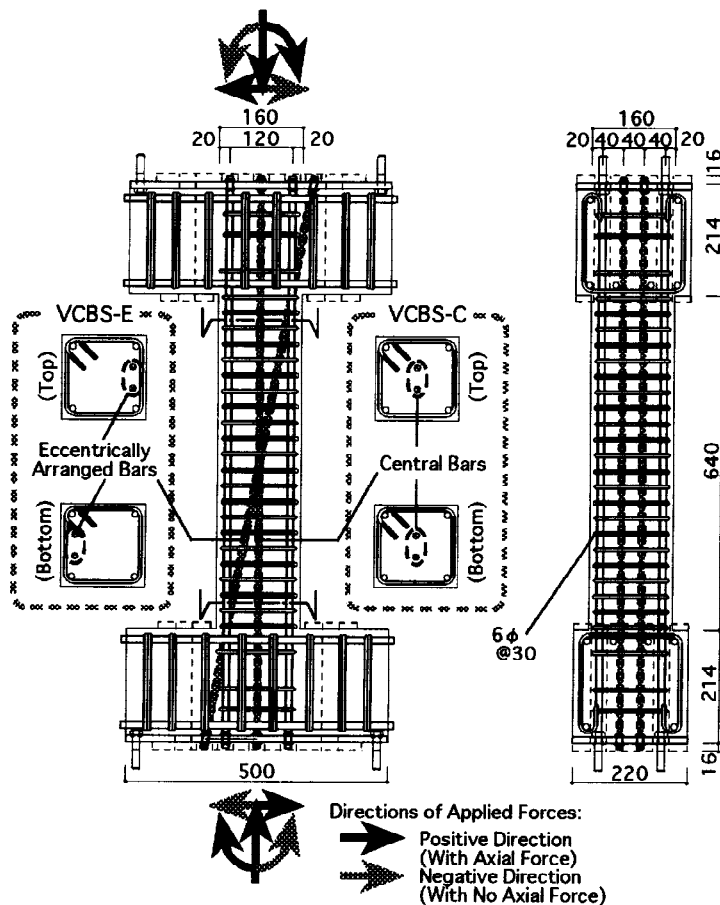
Dimension and detail of a typical specimen for shear-bending test
